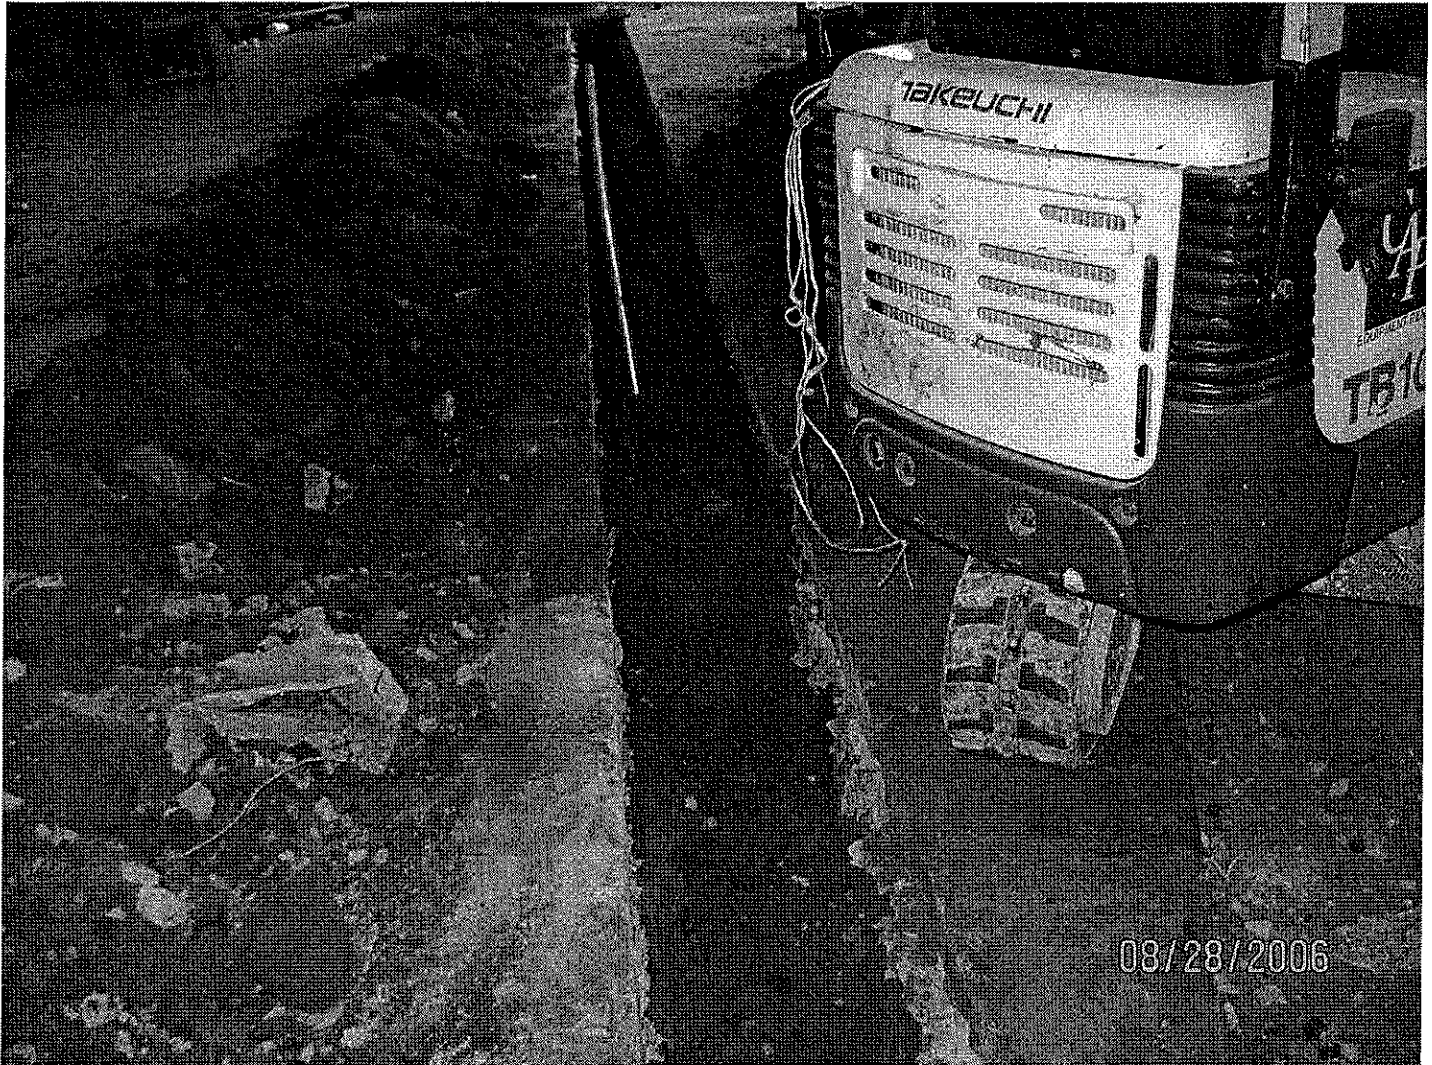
AS/SVE Trench from AS-1 to column as per designed. Depth of the trench 1 foot below slab; width of the trench 18 inches
